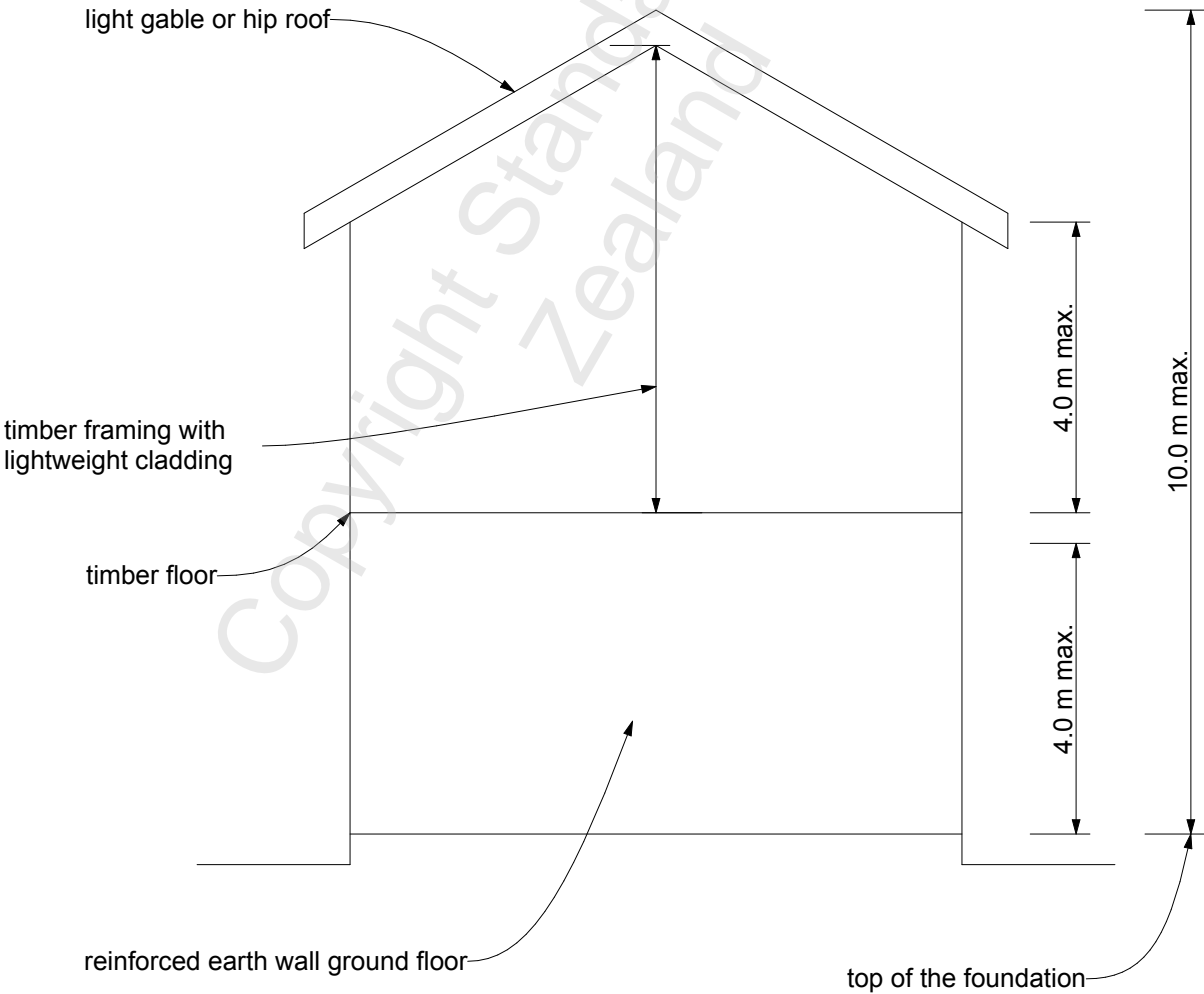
Height limitations for building layout above an earth walled ground floor
